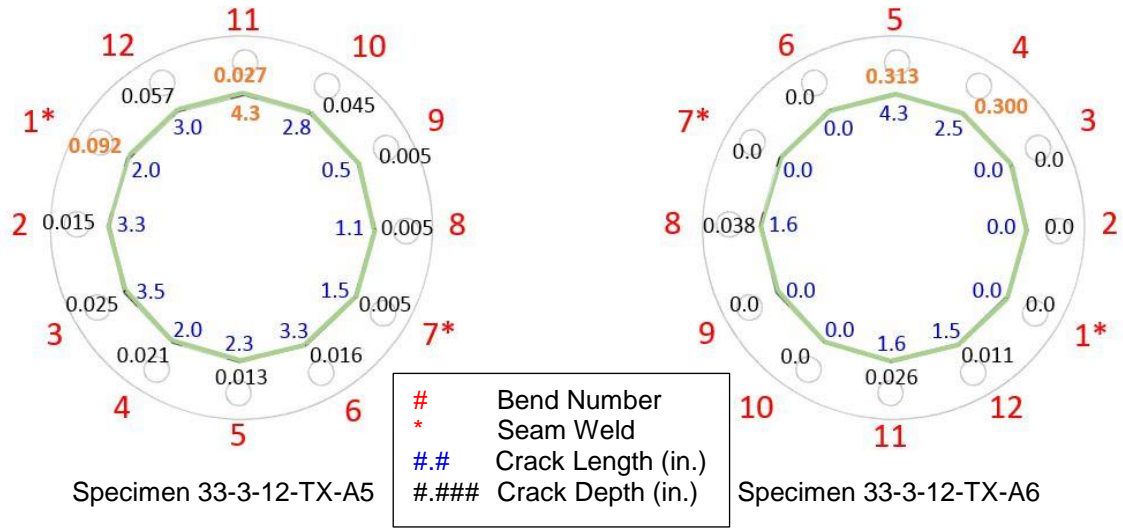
Specimens 33-3-12-TX-A5 and 33-3-12-TX-A6: Cracks after 7.8 Million Fatigue Cycles
